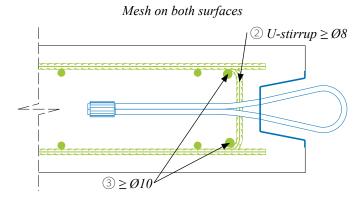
Reinforcement at T-wall joint with WILORA® 20 + WILORA® 50 Connecting Rails.
